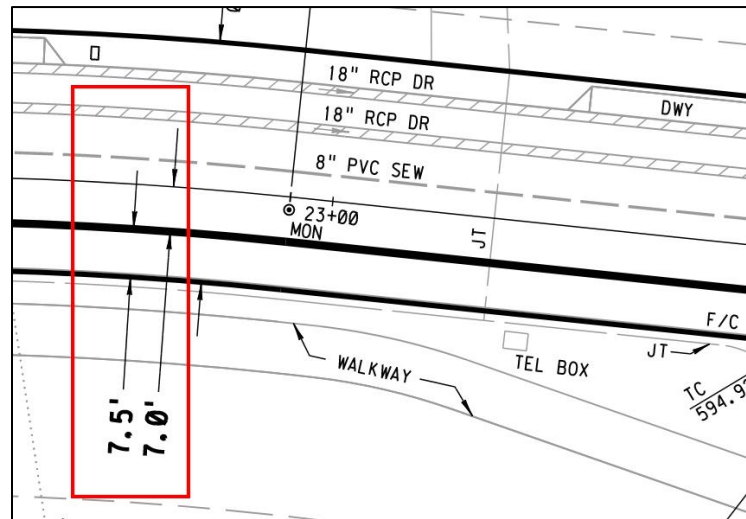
Proposed alignment dimensioning from RW and Face of Curb
